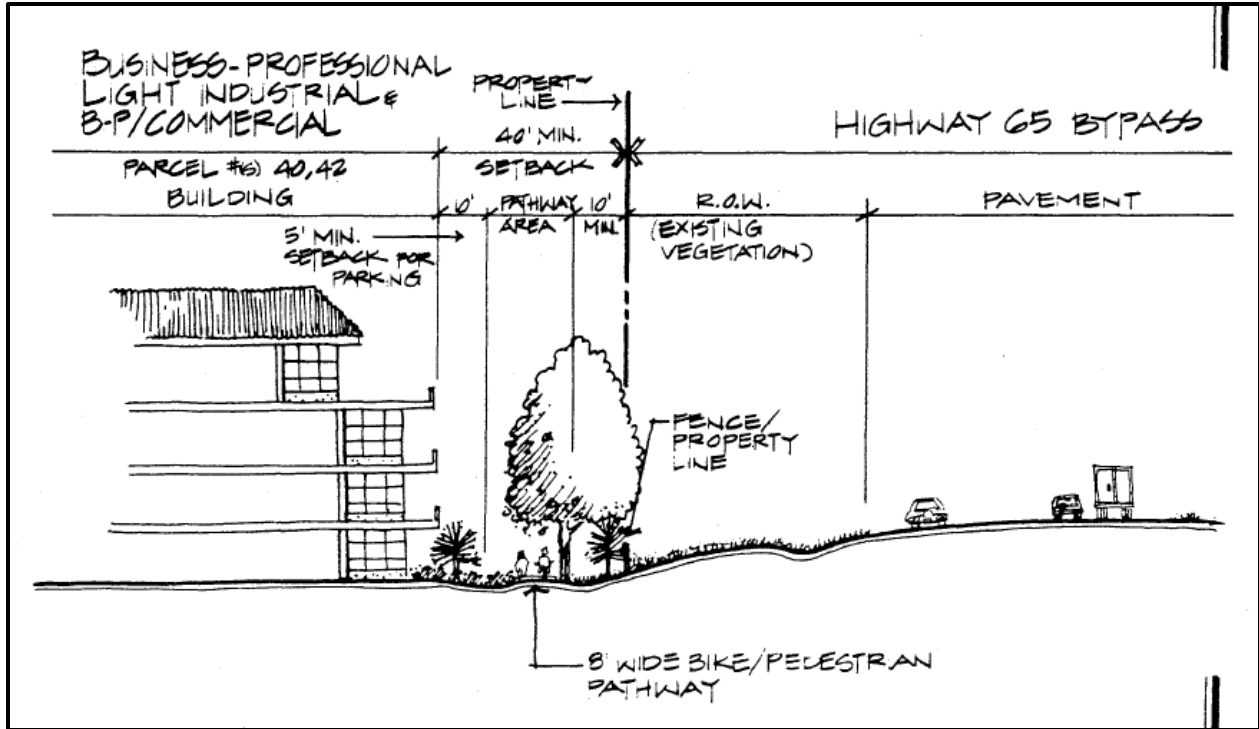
SECTION VIEW – Bikeway Easement Adjacent to Highway 65 Bypass
